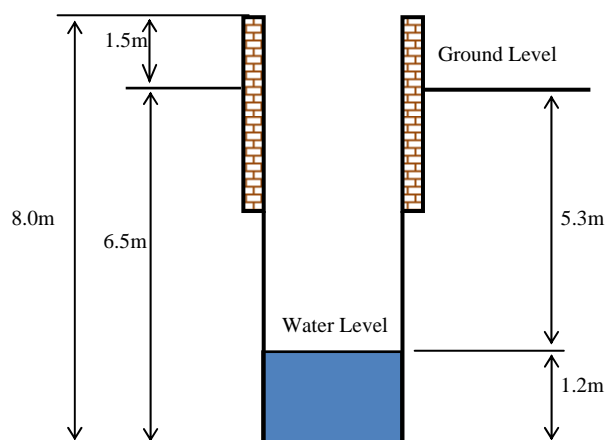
Shallow Well for Hambokto Pilot Farm
